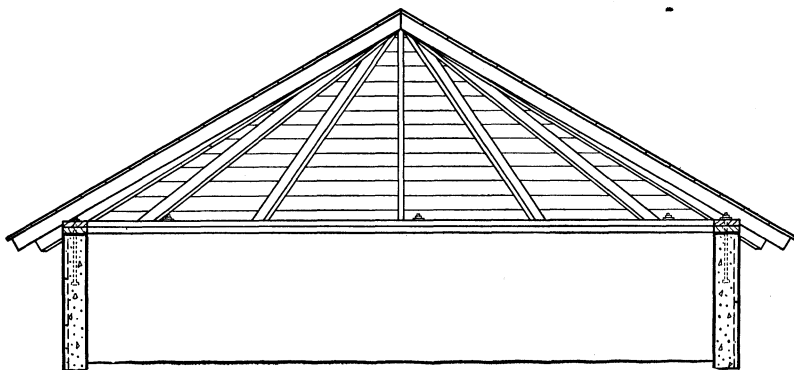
Pitch-roof construction showing anchorage of plate to a masonry wall.
